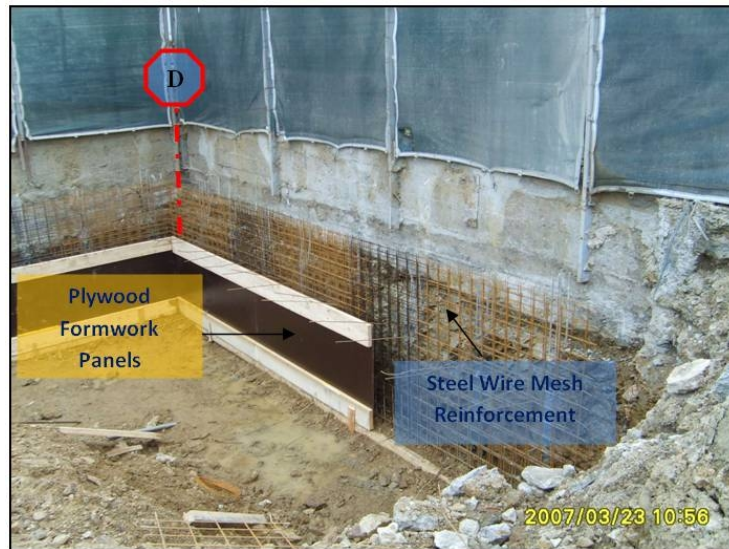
Placing of plywood formwork panels after reinforcement installation.
